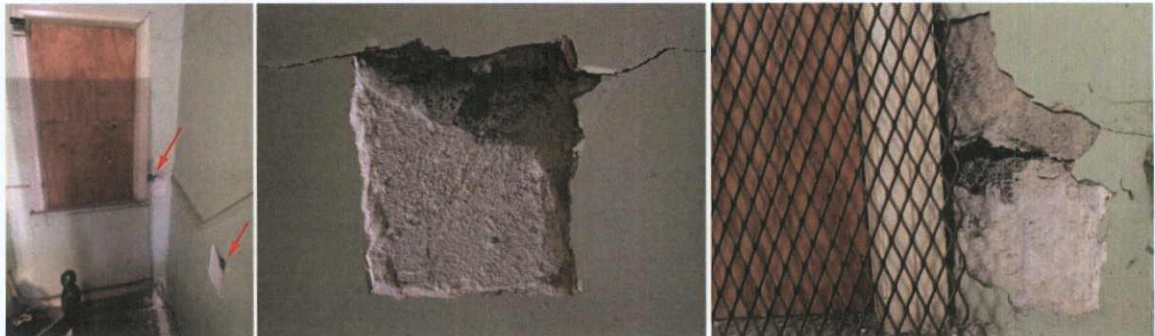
The rear (left) and internal (centre) walls at the stairs are formed of plastered concrete.
